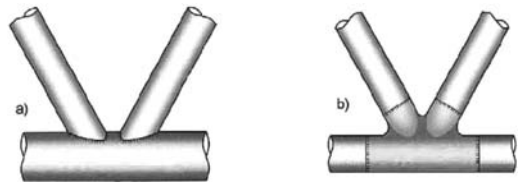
Alternative joint design: a) direct welding of tubes b) cast joint.
